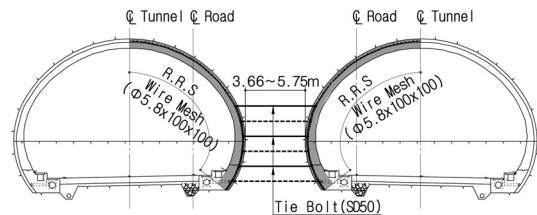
Reinforcement by tensioned tie bolts in close parallel tunnels
